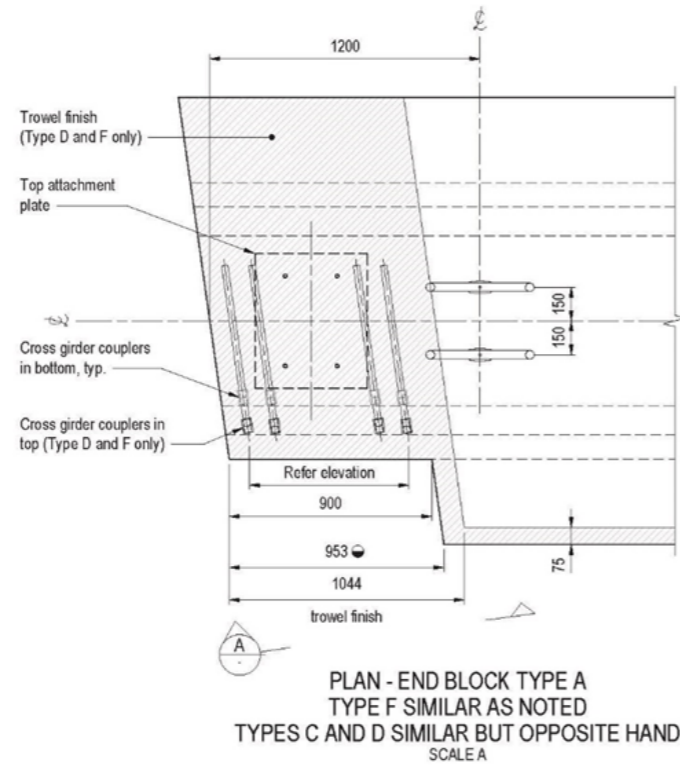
(e) - Example Super-T girder bridge drawings - Sheet 5
